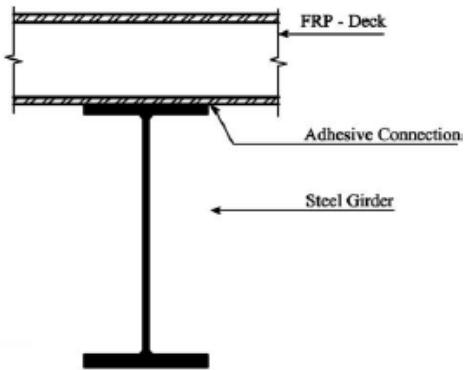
Adhesively bonding of FRP deck and steel girder (Zhou & Keller 2004)
